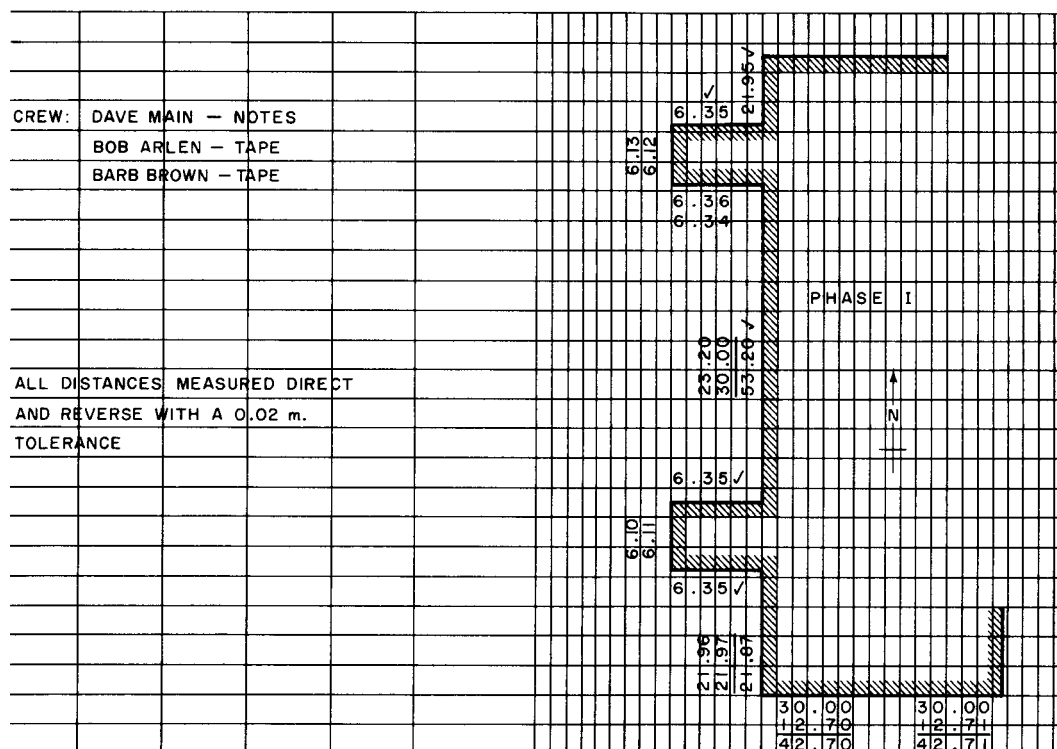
Sample field notes for Project I (taping field notes for building dimensions).
